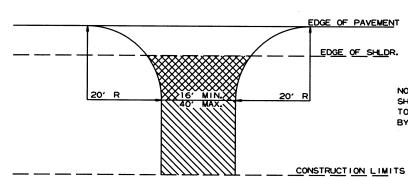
DETAIL FOR COUNTY ROAD TURNOUTS OPEN SHOULDER SECTION
